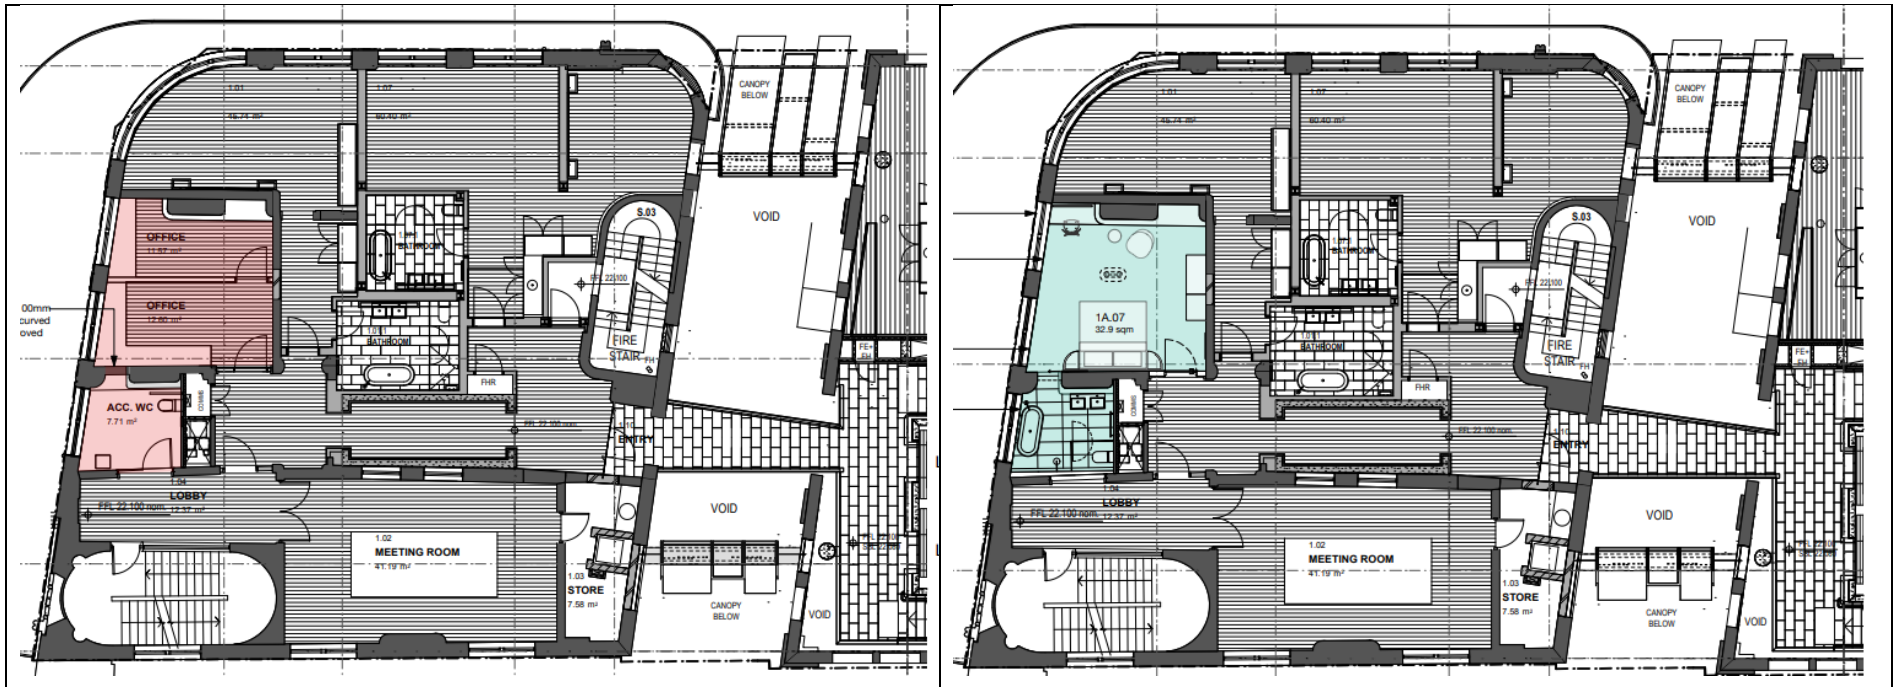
| Approved Manager's Office on Level 1 (left) and proposed conversion into hotel room (right)
